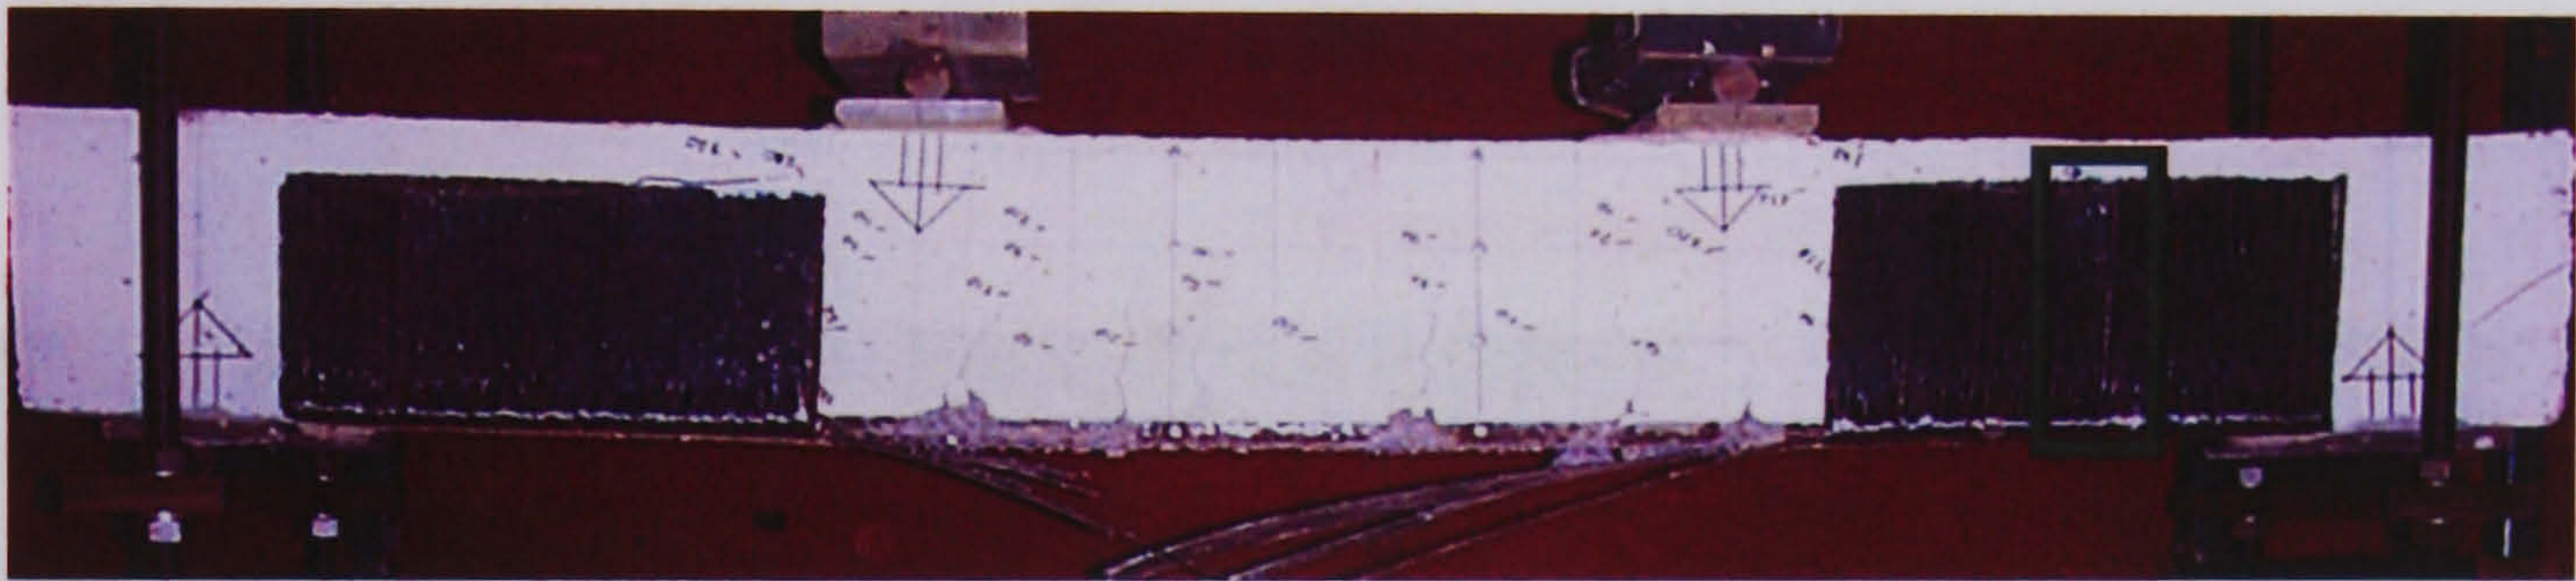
CFRP laminate rupture at the mid span, Beam III-UH-T
